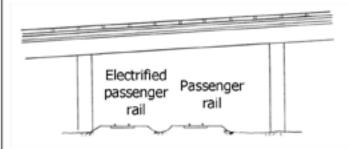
Bridge elevation view with an electrified passenger rail track and a non-electrified passenger rail track below the bridge.
